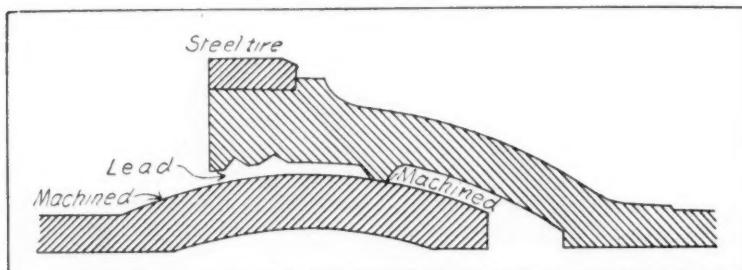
FLEXIBLE JOINT ON PIPE ACROSS THE HACKENSACK RIVER
